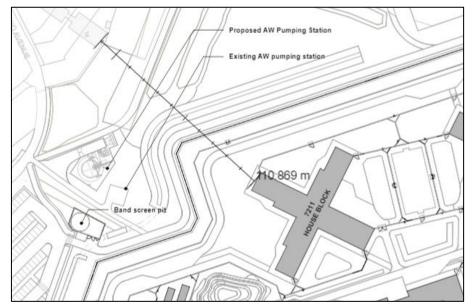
Extract of layout plan indicating location of Houseblock 1 (7211) and closest neighbouring property (76 Welland Avenue)
